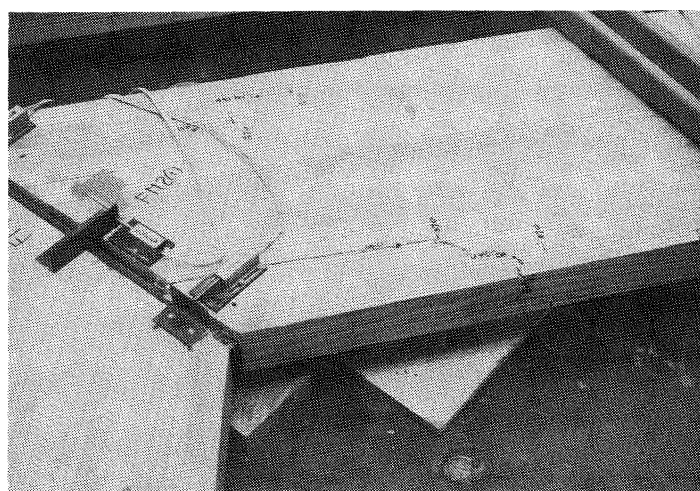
Failure of knee joint with mitred steel connection and epoxied rods.
